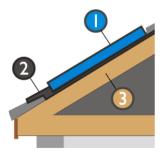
In-roof Application (Horizon Renewables, 2013)
